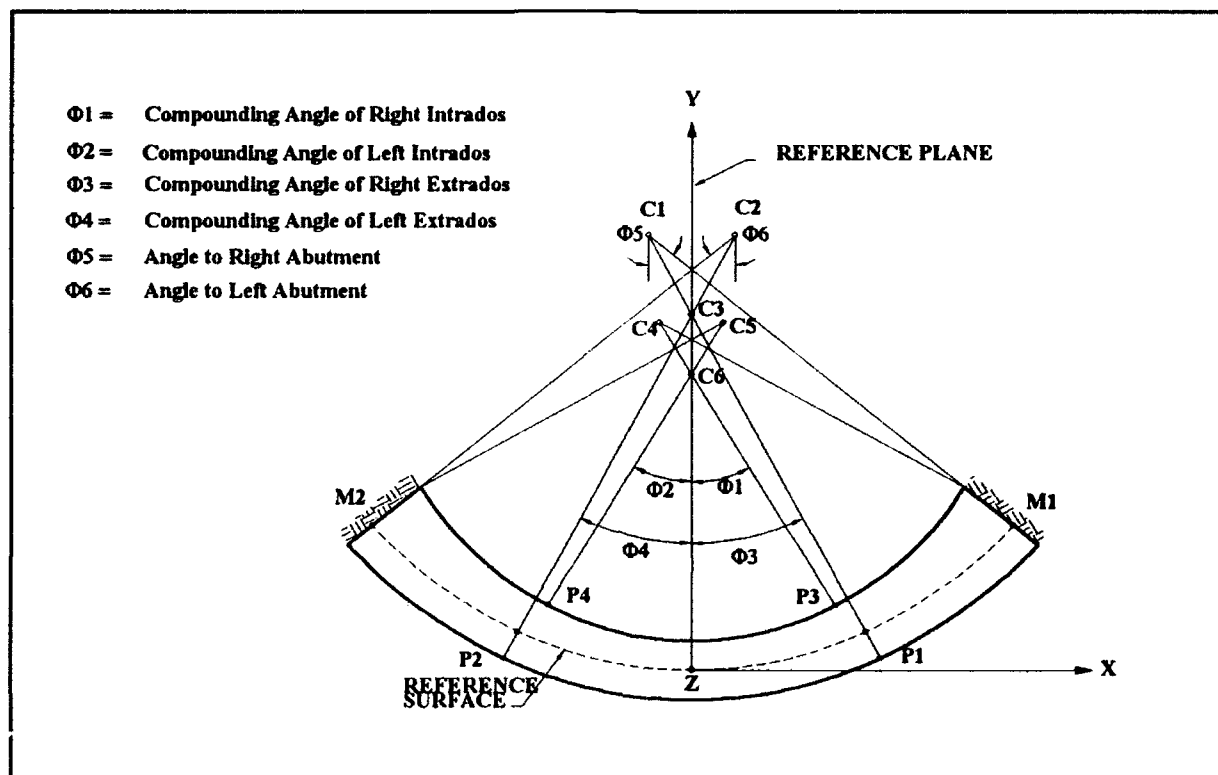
Typical Horizontal Section of a Three-Centered Arch Dam
